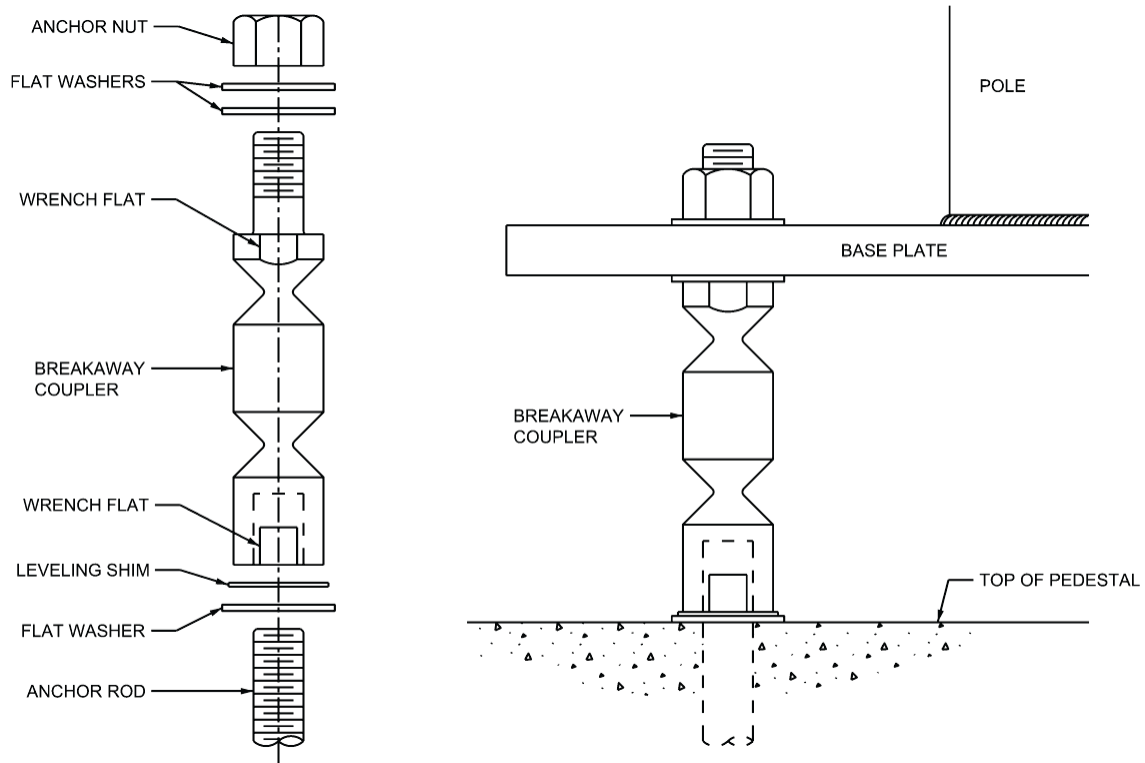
Illustration. Steel double neck breakaway coupler assembly.
